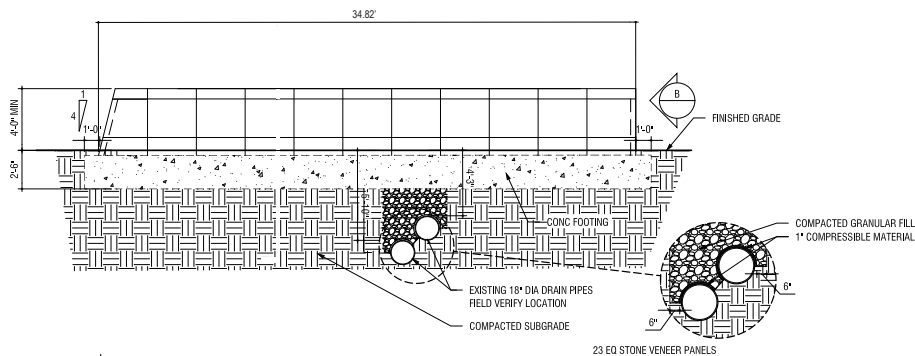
Figure C. Western Stone Wall Elevation with Signage Elevation South Face
